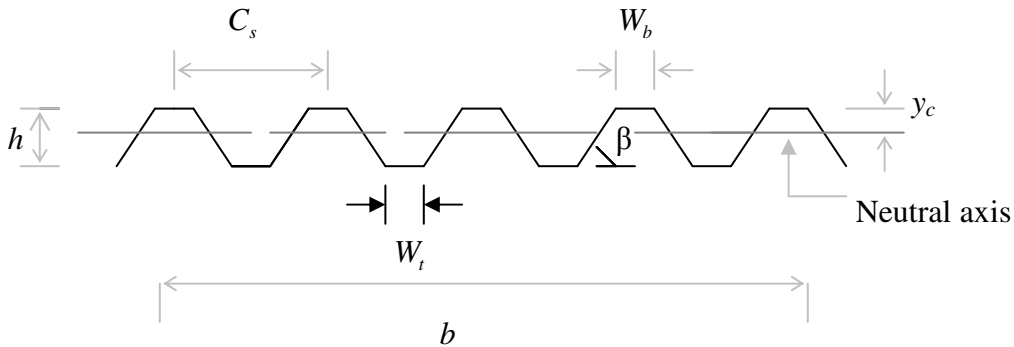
Typical cross-section of trapezoidal profiled sheet
